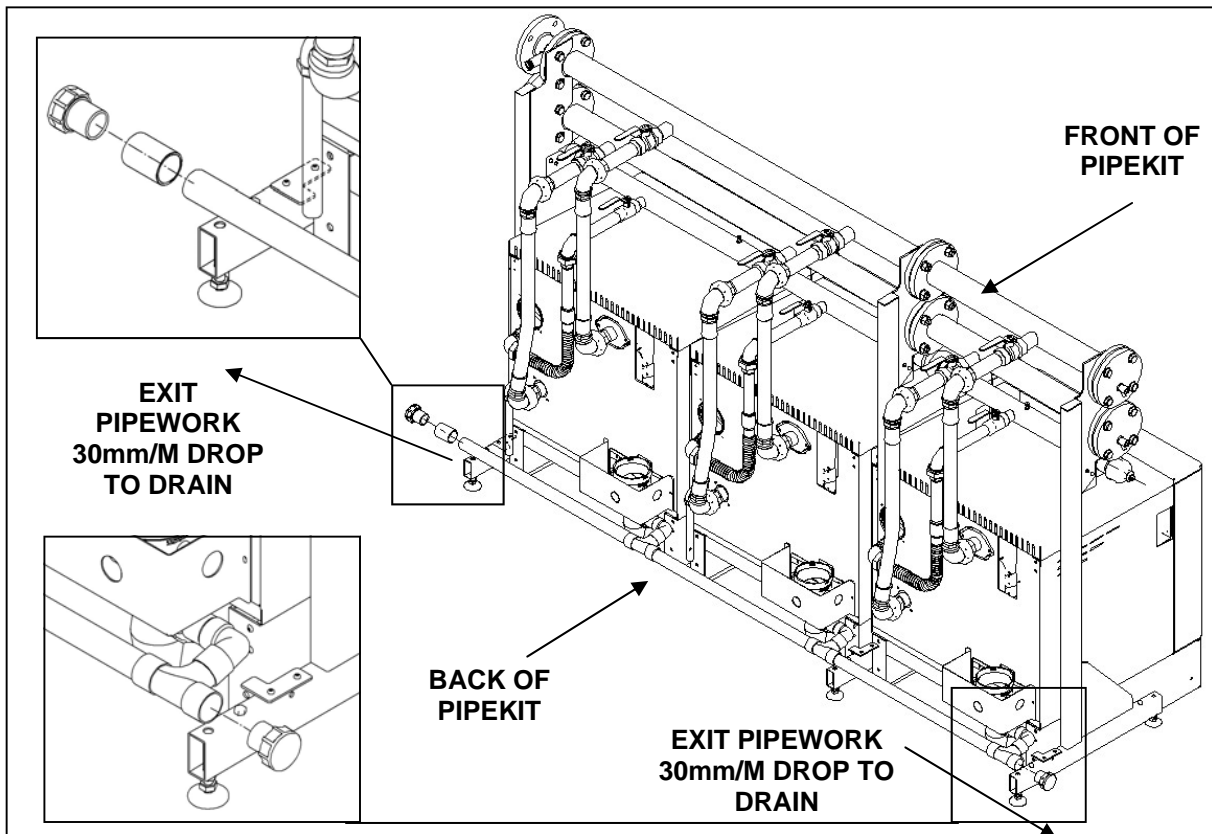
Assembly Of Rod Eye To Either End Of Pipe Kits (F40H & F250H Boilers)
